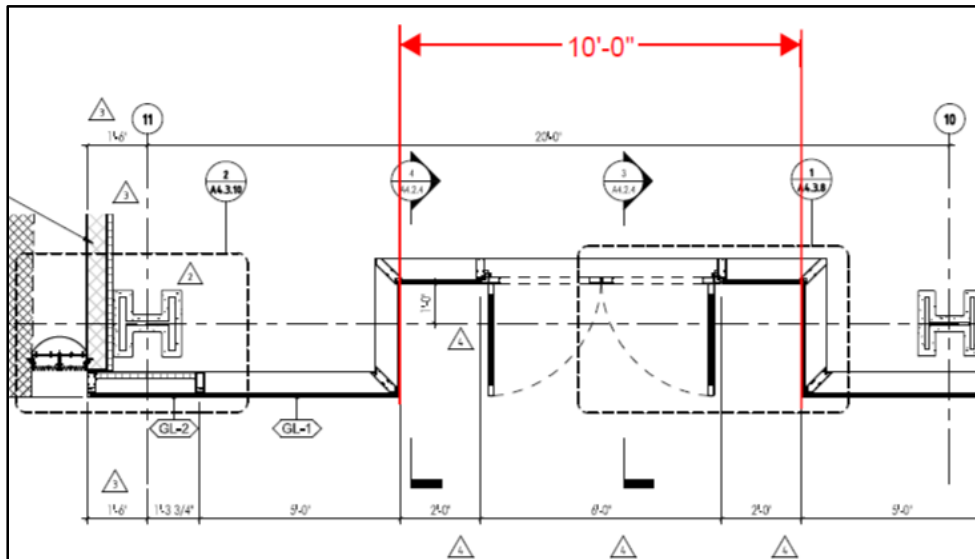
RFI 166 - Conflicting Structural and Architectural Dimensions on Entrance Returns – Turner Construction
